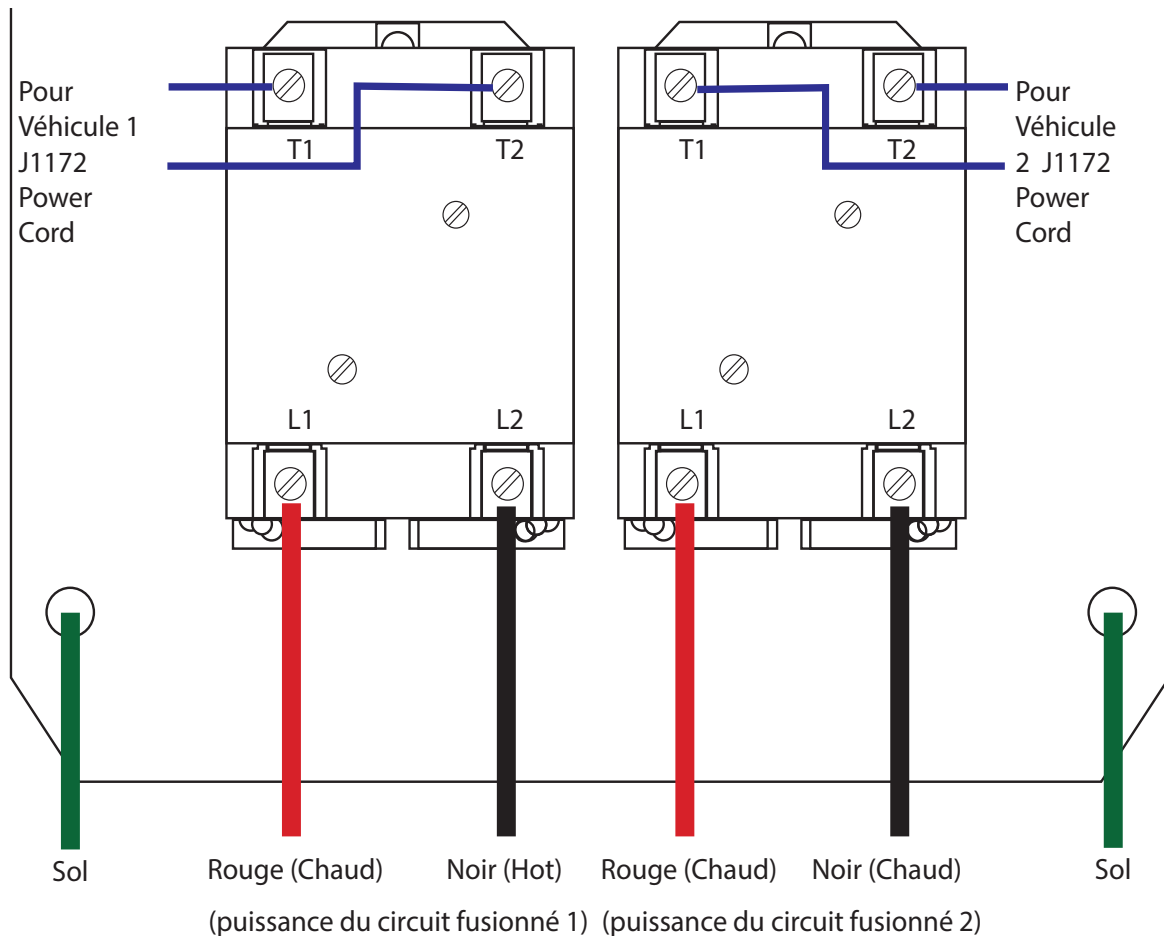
Wiring QuadZilla Equipped with GE Contactors (Alternate)
